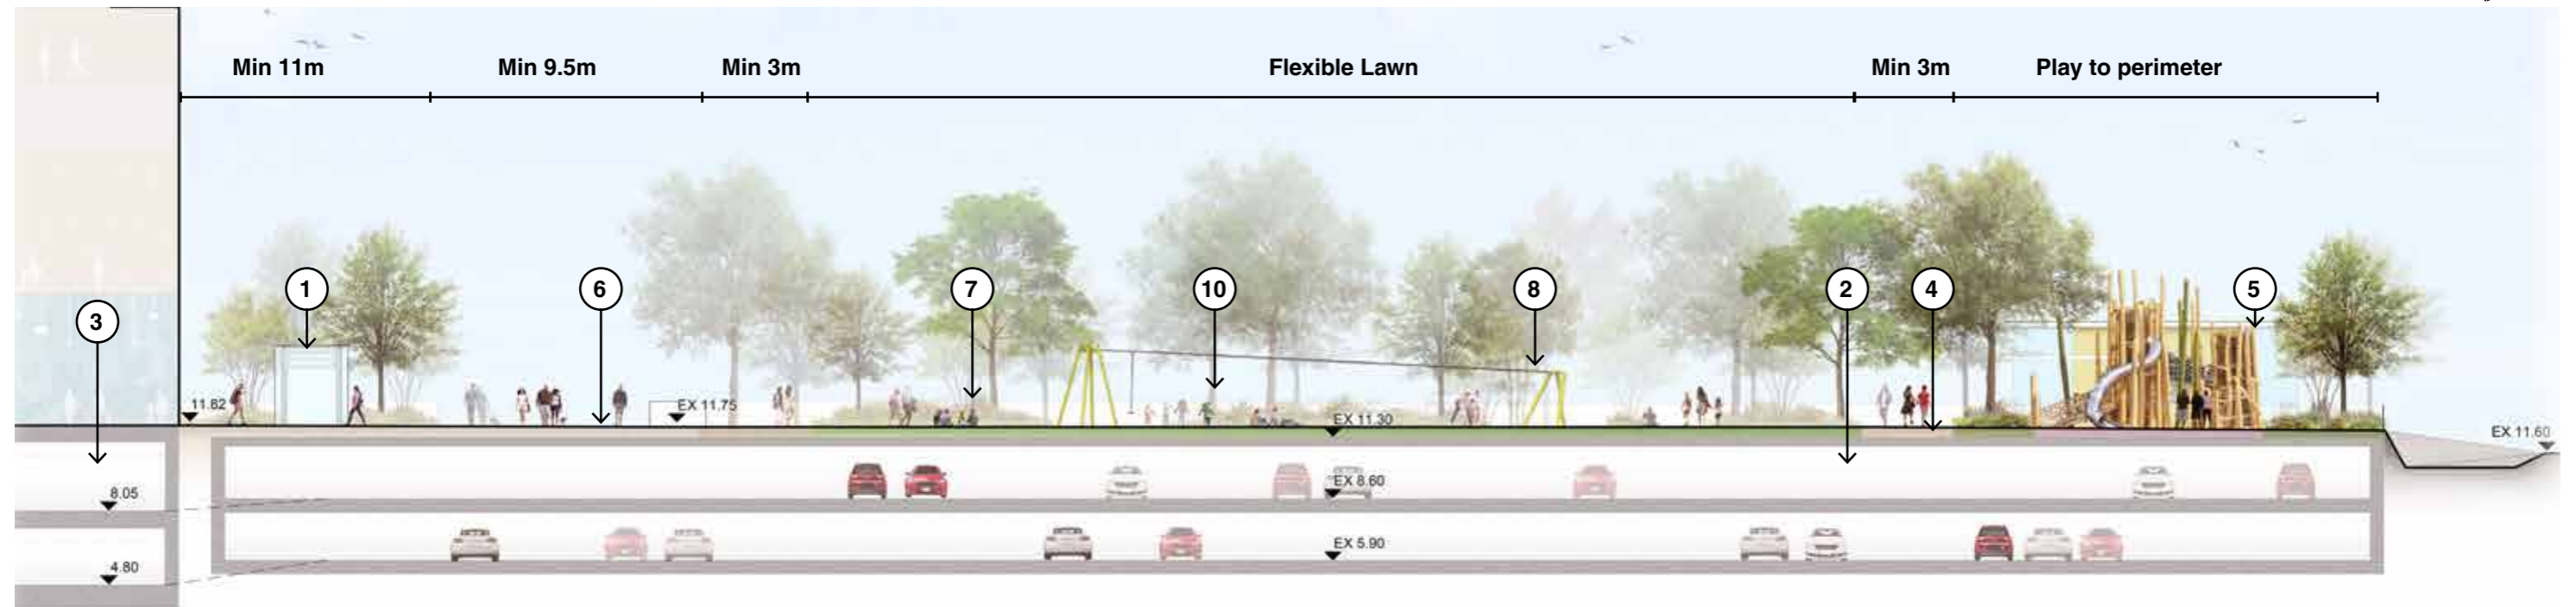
Section D - D looking south towards La Route du Port Elizabeth
